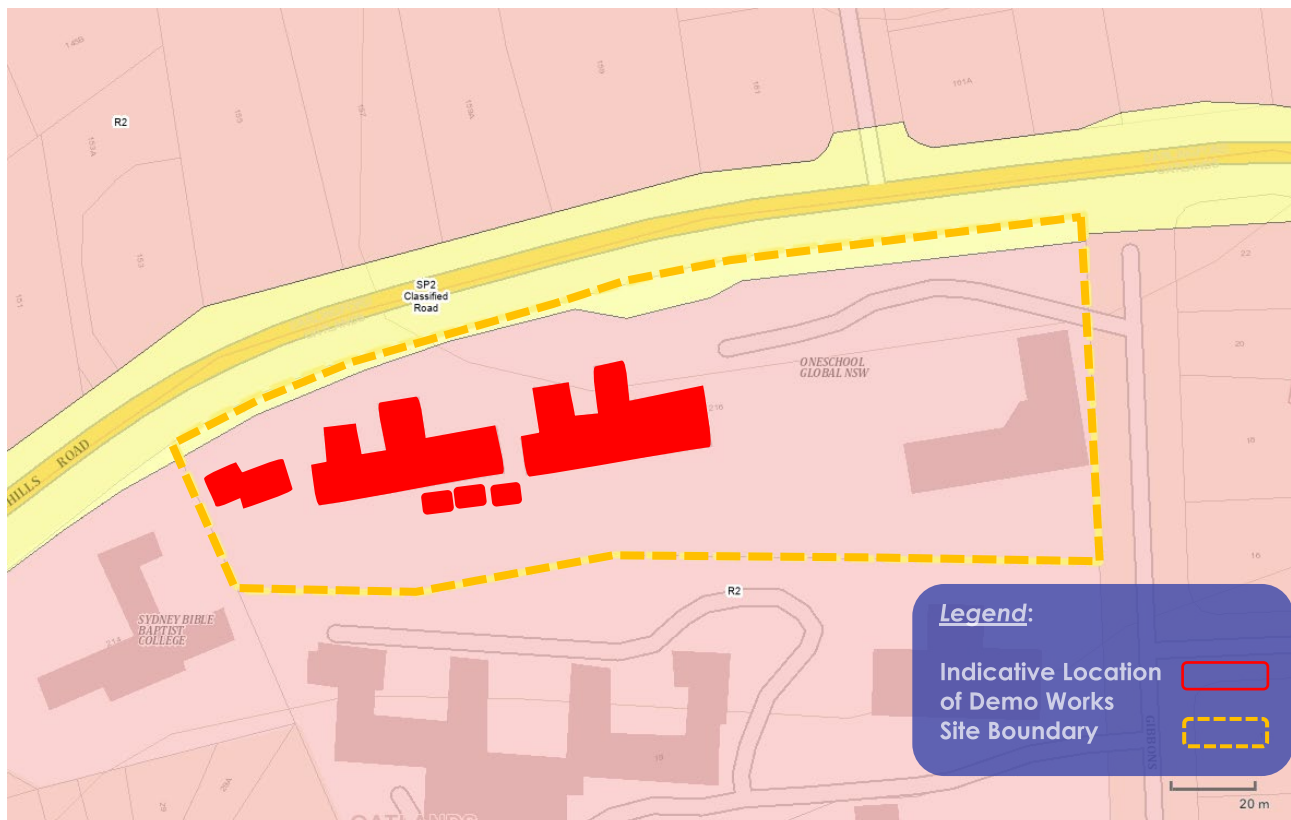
Location Plan (source: Planning Portal Spatial Viewer)
